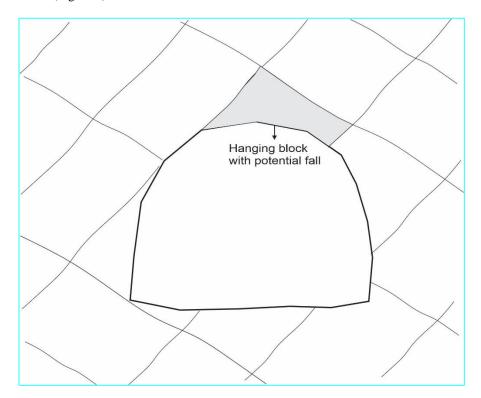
Potential block fall from the roof of an underground structure located at shallow overburden
